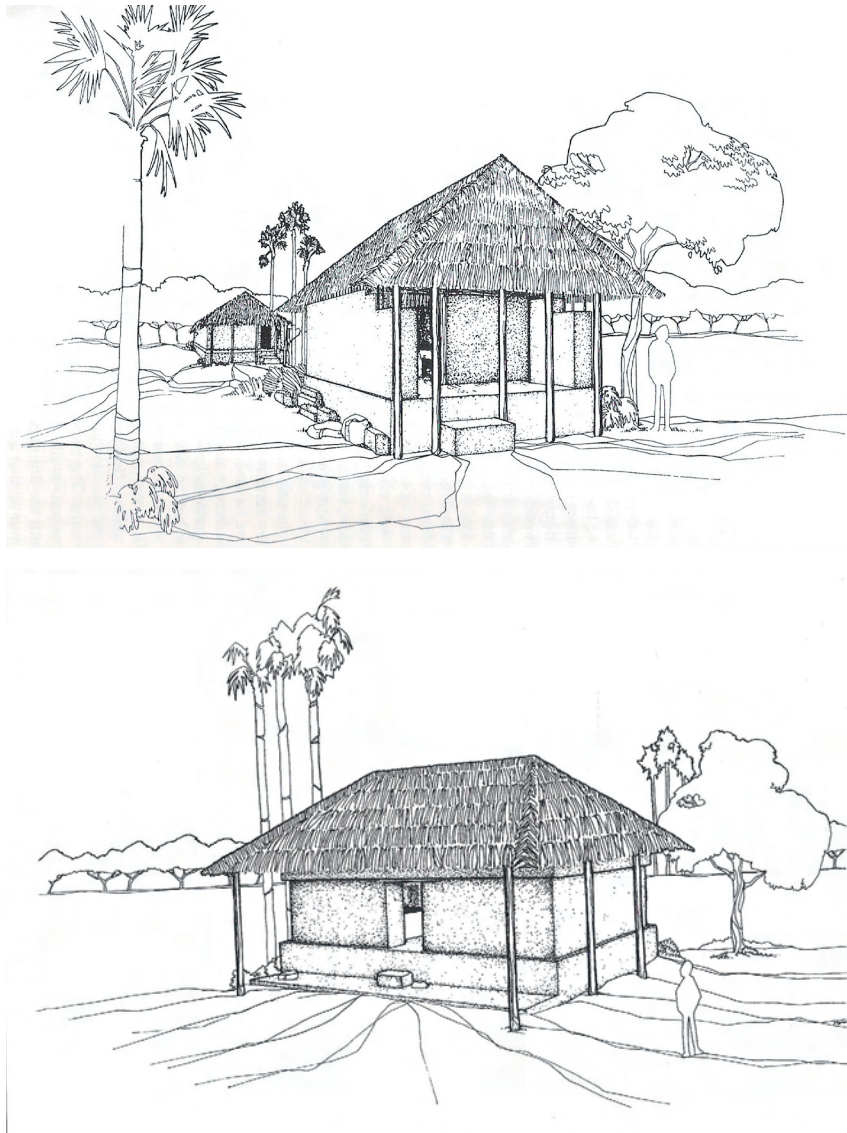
Reconstructions of Households 1 (top) and 2 from the Ceren site in La Joya, El Salvador. Ceren is one of the earliest known Maya settlements. Note the rectangular and square plan forms, solid adobe walls, and the roof being supported by detached timber structural posts. Source: Sheets, p.63 & p. 90 (1992).
